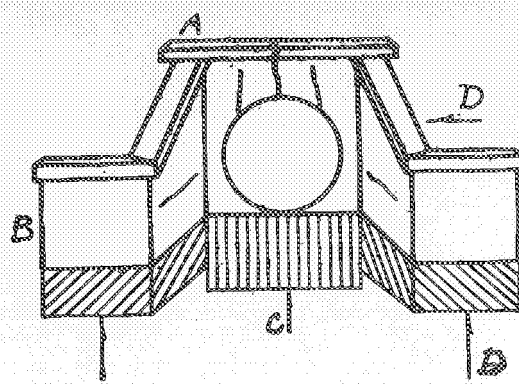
Cracks in End and Wing Walls of Conduit
